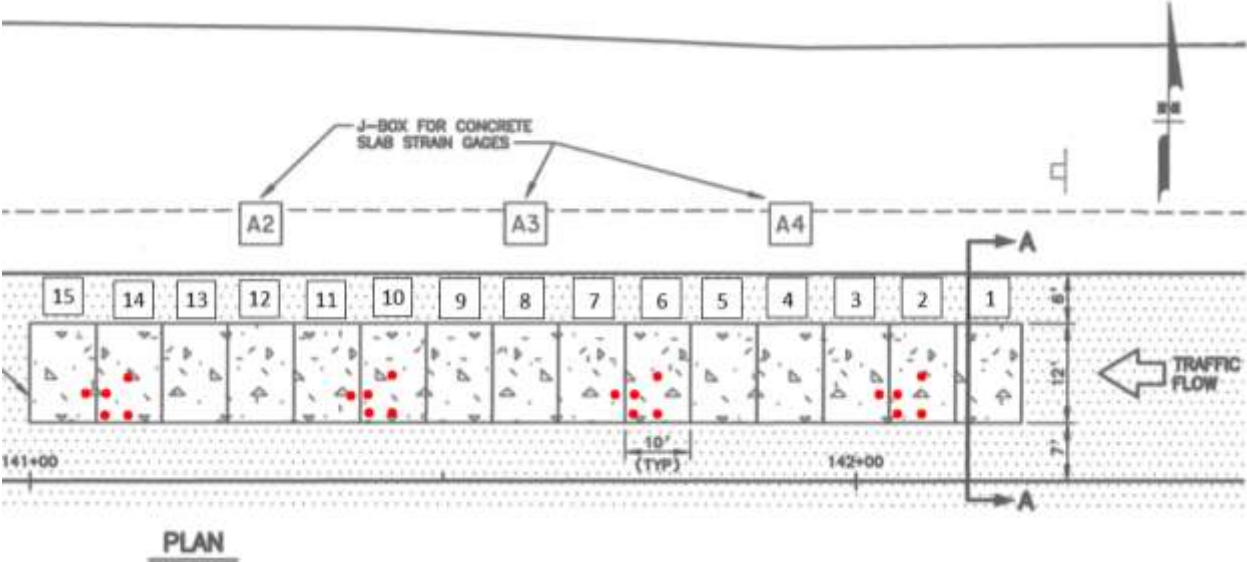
Locations of FWD tests at center, edge, corner and joint on the SFRRRC test section (Abou Eid, 2018).
